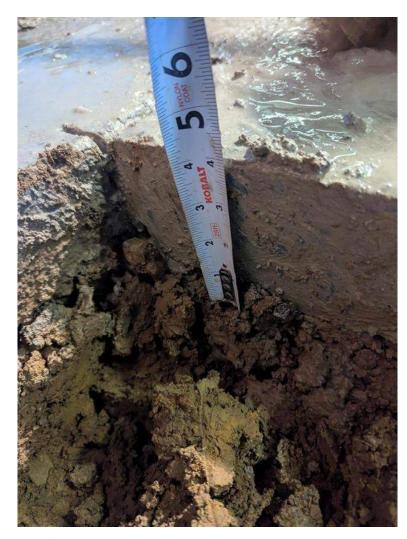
Interior Test Pit TP-2A; view of floor slab thickness
